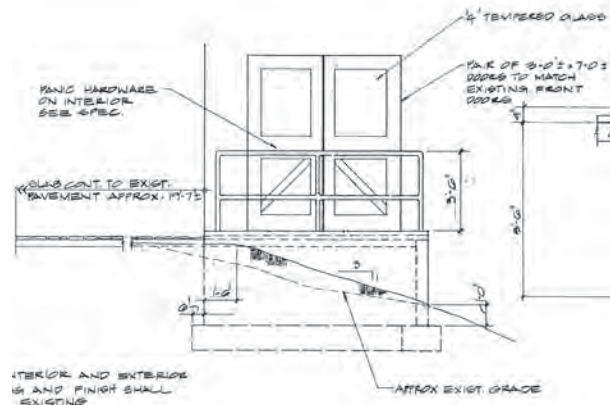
Drawing showing design added east doorway. Note single light-over-single panel design matching that of original doors. No photographic record of these doors has been found; however, the doors currently in place are replacements, as determined by visual inspection of the frame. (BLRI Coll., Drawing No. 106-80002, ETIC)
